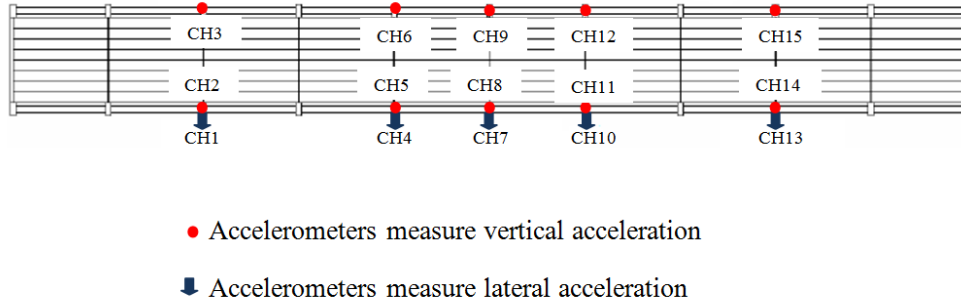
Accelerometer layout in the plan view of bridge deck
